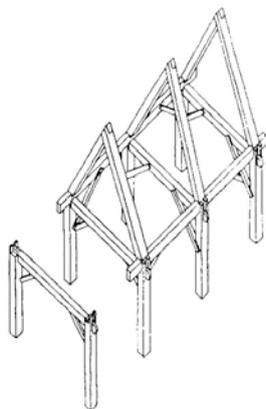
The principle of post-and-truss construction. (drawn by P. Pundt; source: Ahrens, 1981, Fig. 72) Each pair of opposing columns or posts is linked by means of a horizontal beam to form a frame. Header beams join the frames together.
